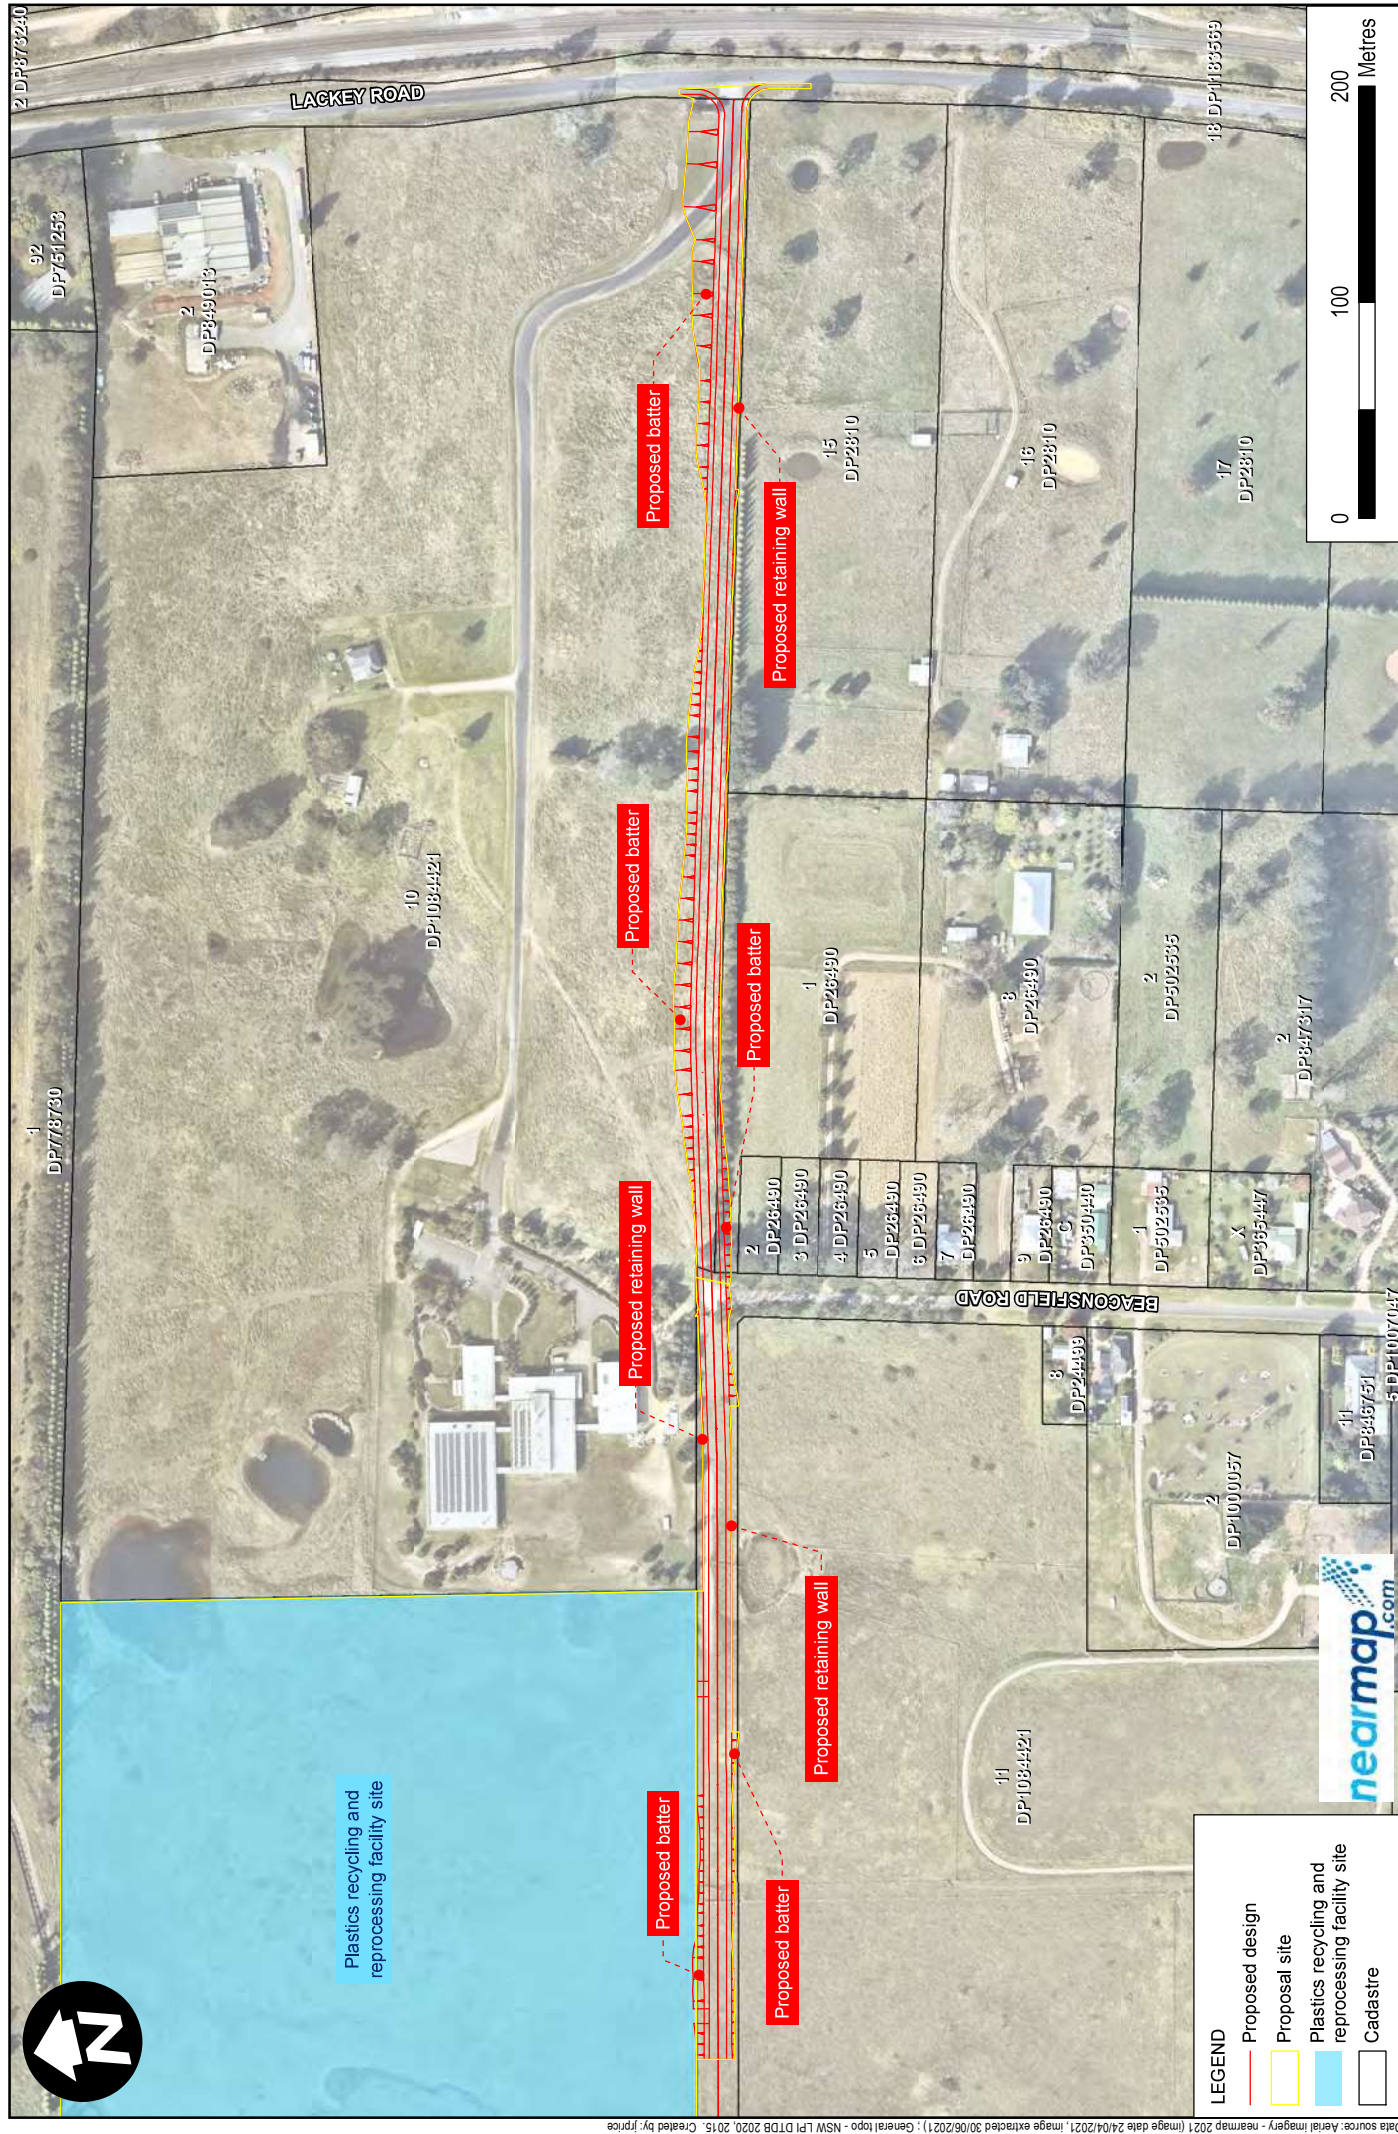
Option 2b: New access road – connecting Lackey Road with the plastics recycling and reprocessing facility site (alternative alignment)
